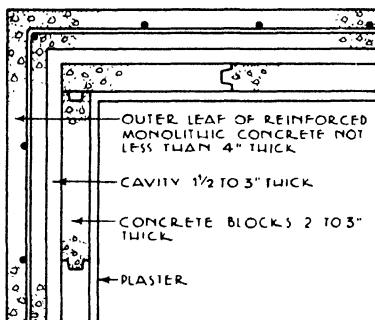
CAVITY WALL HAVING OUTER LEAF OF REINFORCED MONOLITHIC CONCRETE AND INNER LEAF OF PRECAST CONCRETE BLOCKS
